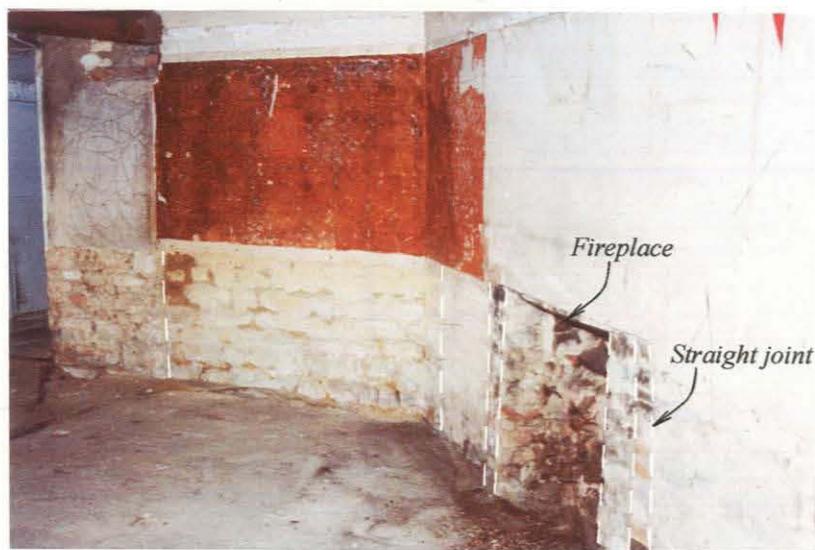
Room 64/2, no.64, looking east-southeast; the walls display a complicated sequence of building and re-building and comprise discrete areas of brick and roughly coursed limestone rubble. The southeast wall (right of picture) features a stone-built fireplace with iron lintel, now partly blocked with bricks.
